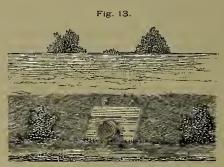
shows the end of a pipe culvert, protected by a small abutment of stone or brick. The foundation should of course extend far enough down into the ground to be below the influence of frost, as otherwise the alternate heaving and settling might throw the end pipe out of position. When stone or brick abutments are too expensive, a good and cheap substitute can be made of planks, by setting them on end, deep enough in the ground to hold them in place, and fitting them closely about the pipe; or still better by setting a post each side of the pipe (see Fig. 13), and by spiking the planks on horizontally, as represented above.
